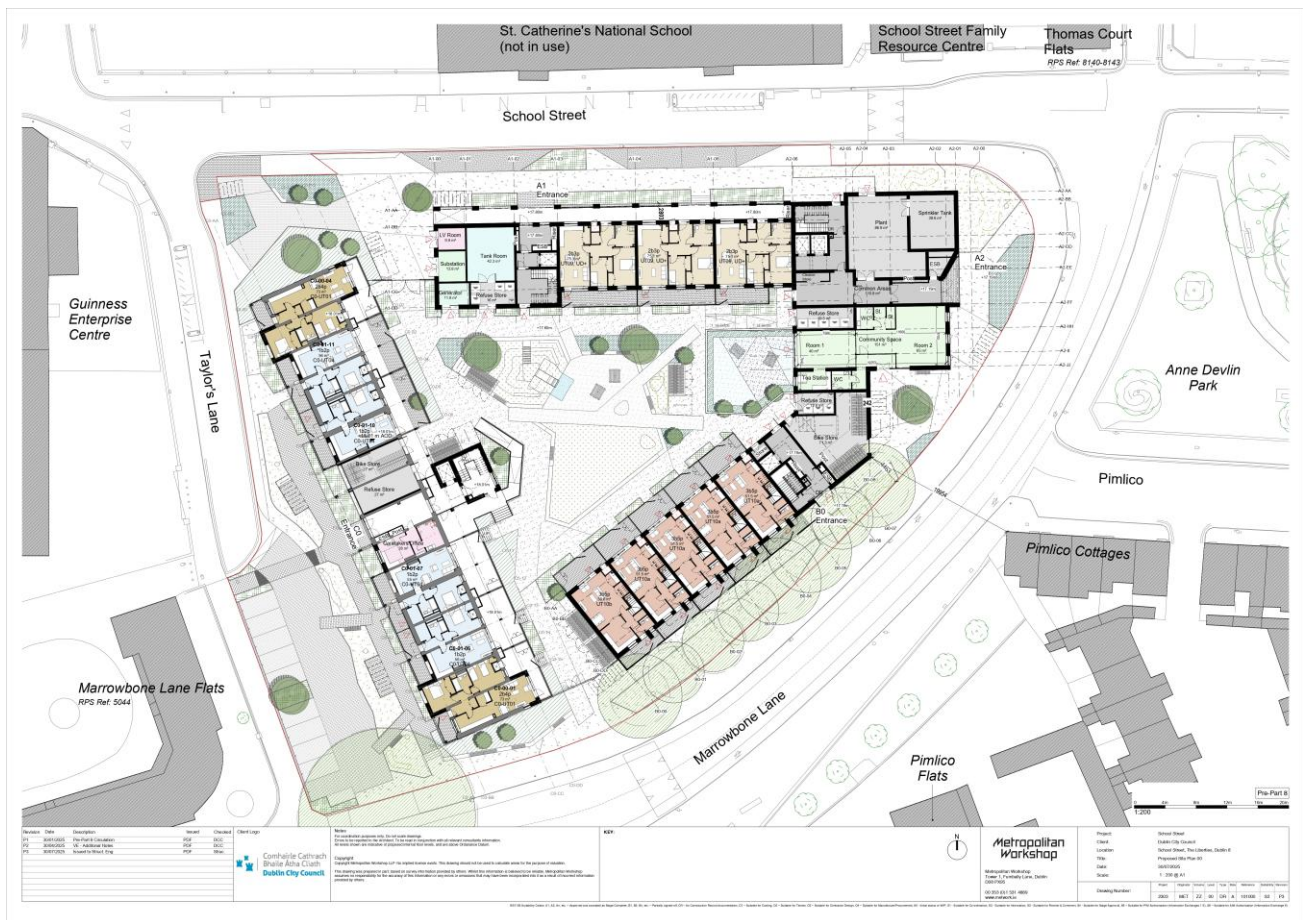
Proposed Site Layout Plan (Source: Metropolitan Workshop Architects)
